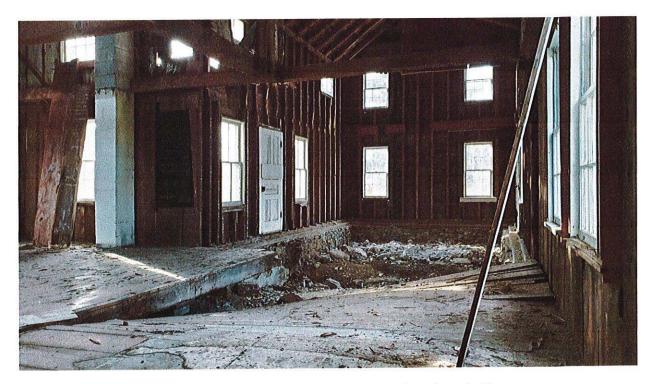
Gutted interior with collapsed floor, middle portion and south end of house.
